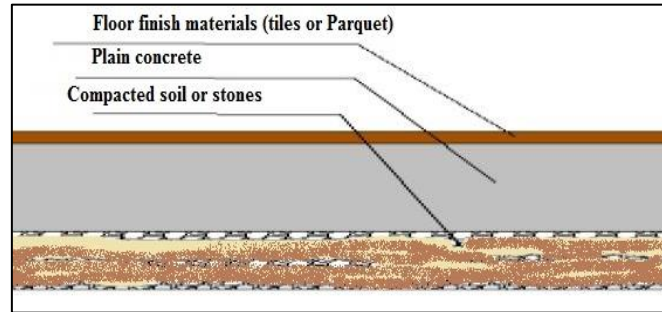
Typical section in floor in semi-arid climate houses (Lstiburek, 2014)
